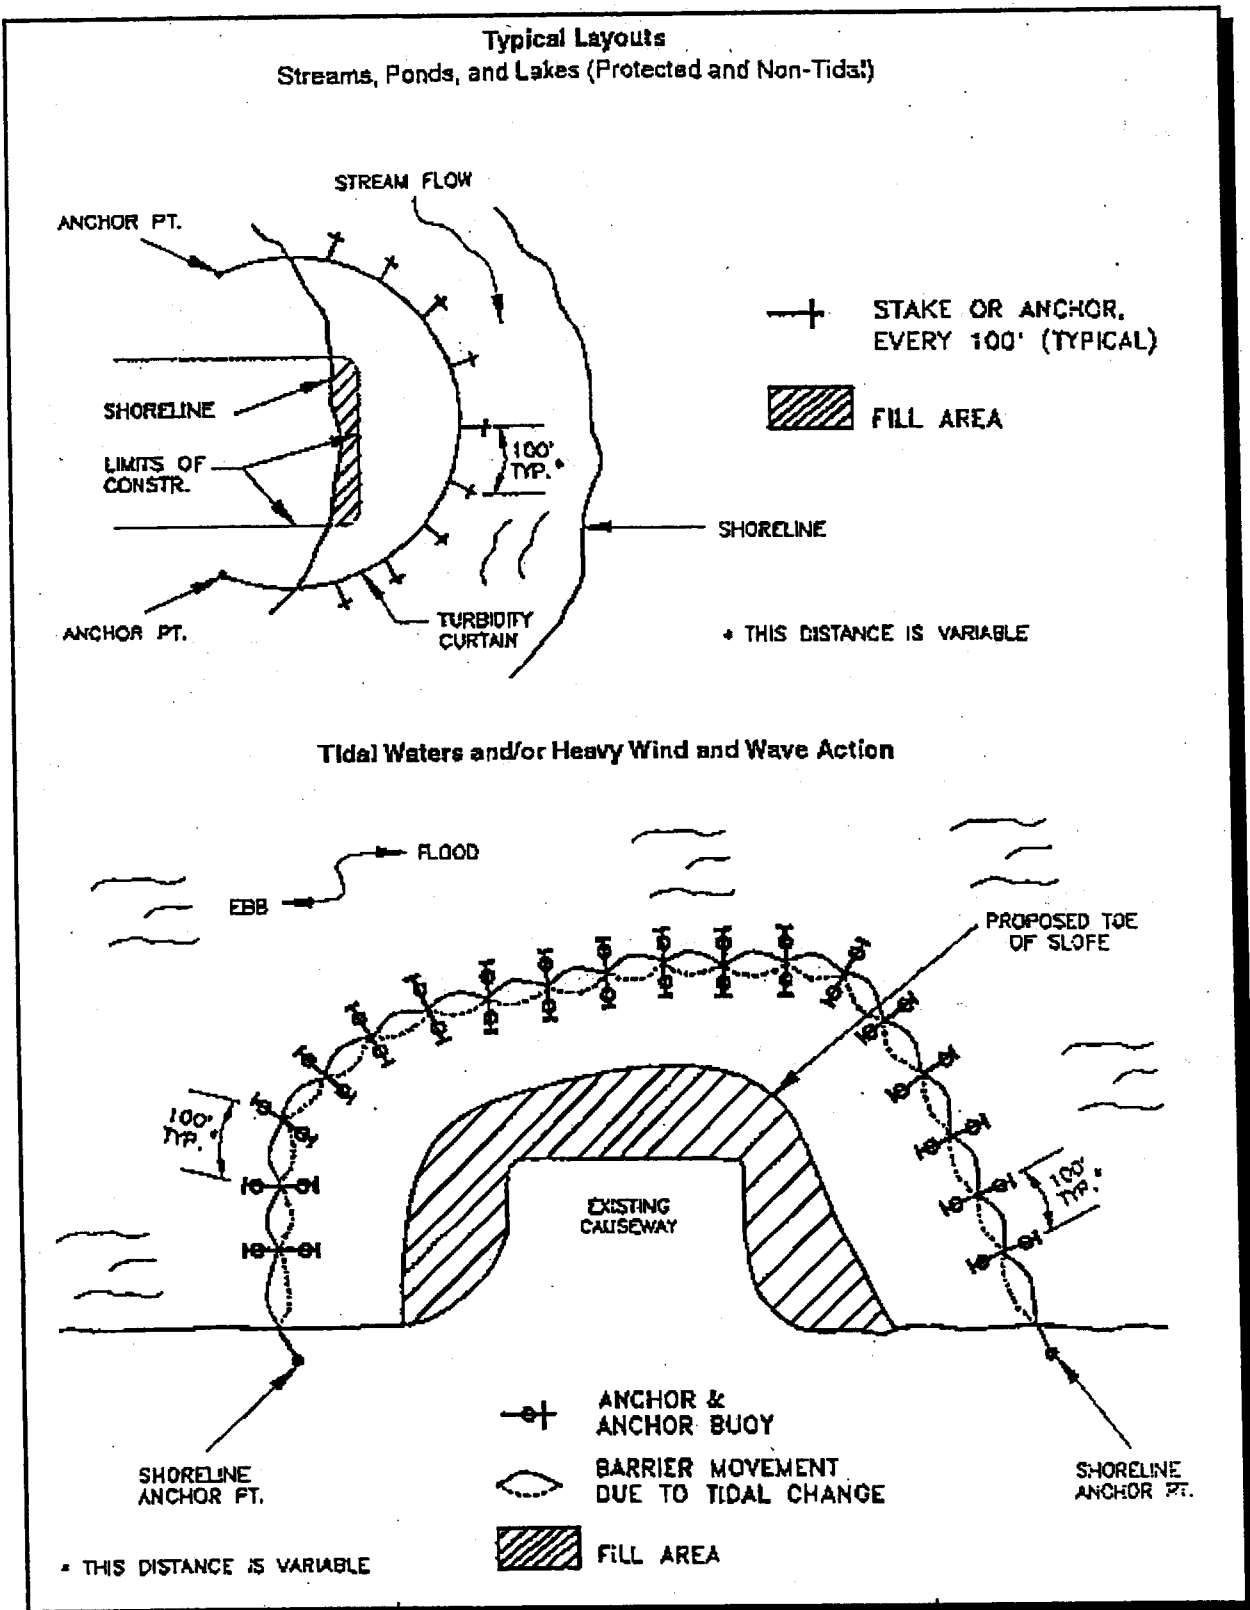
Typical Installation Layouts -- Source: FDOT Roadway and Traffic Design Standards
